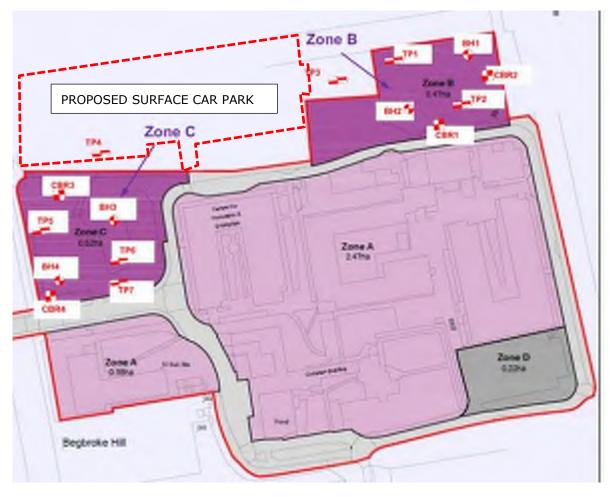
Infiltration Test Location Plan Extracted from Ground Engineering report C15387, dated August 2021
